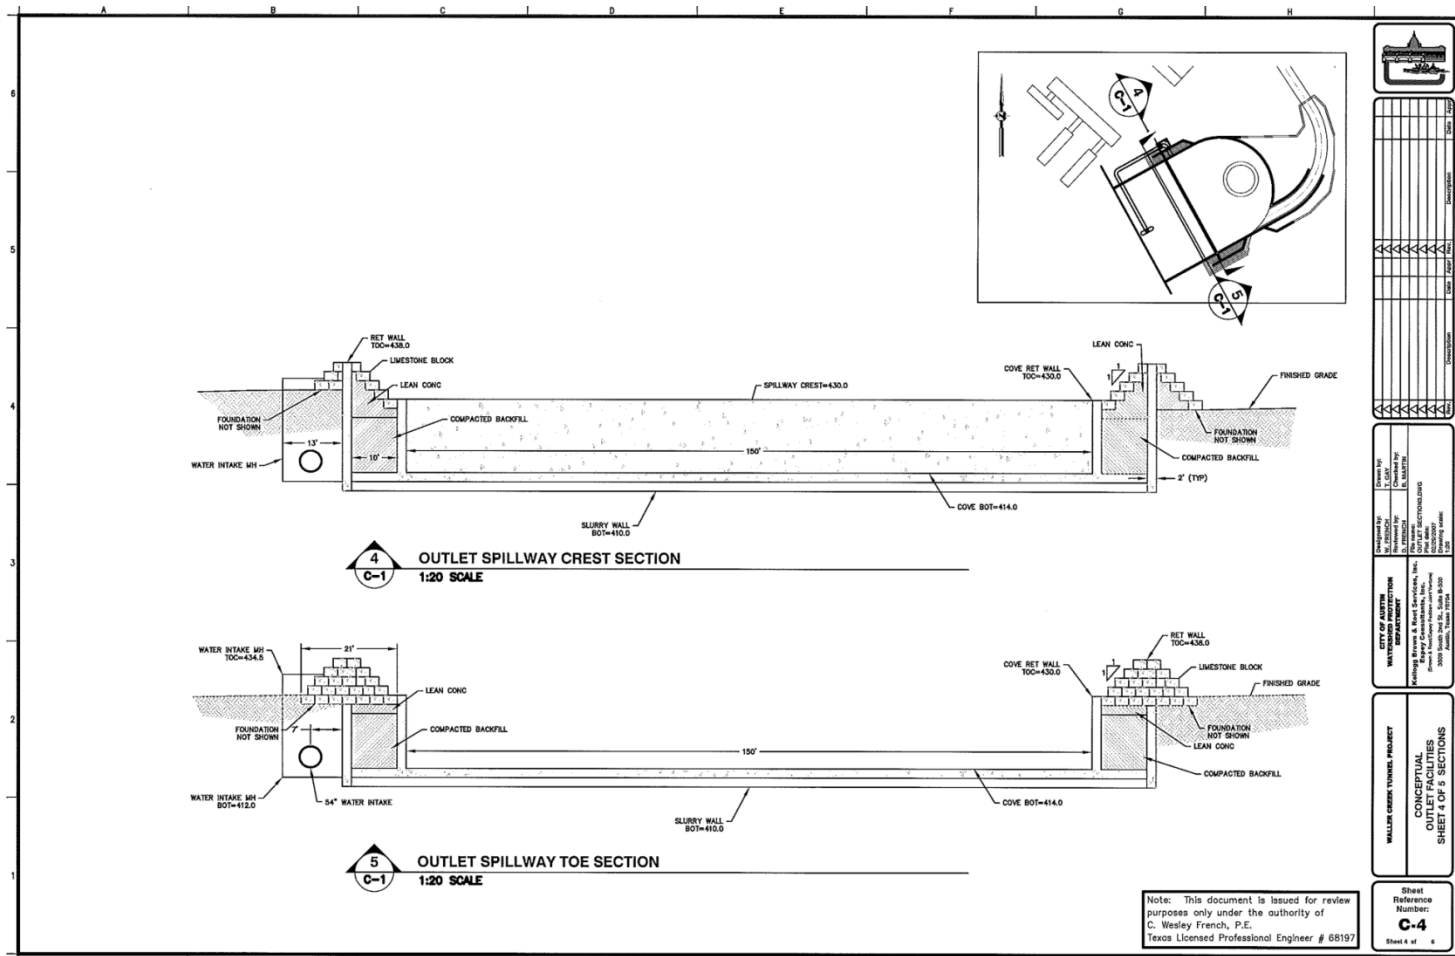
Waller Creek Tunnel Project; Outlet-Section
